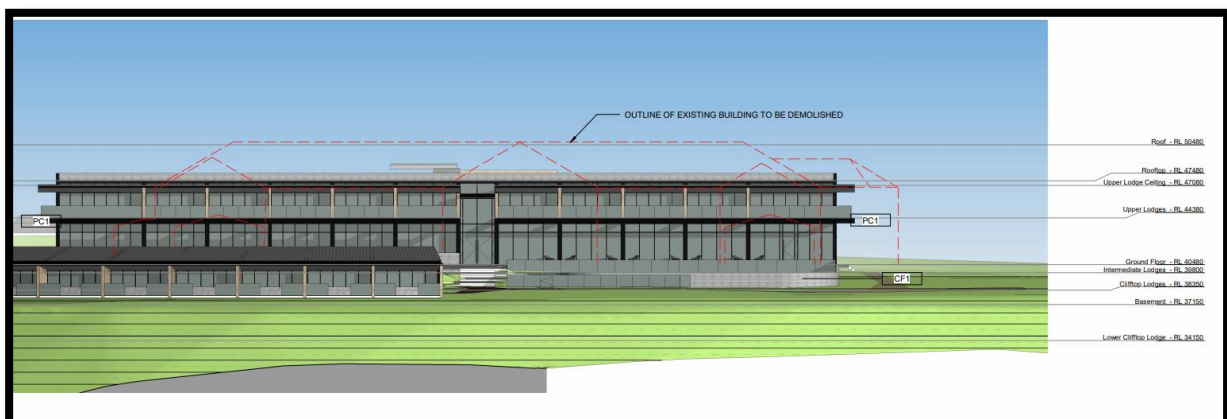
Southern Elevation – Height Plan of Main Building – Rooftop RL 47.480
